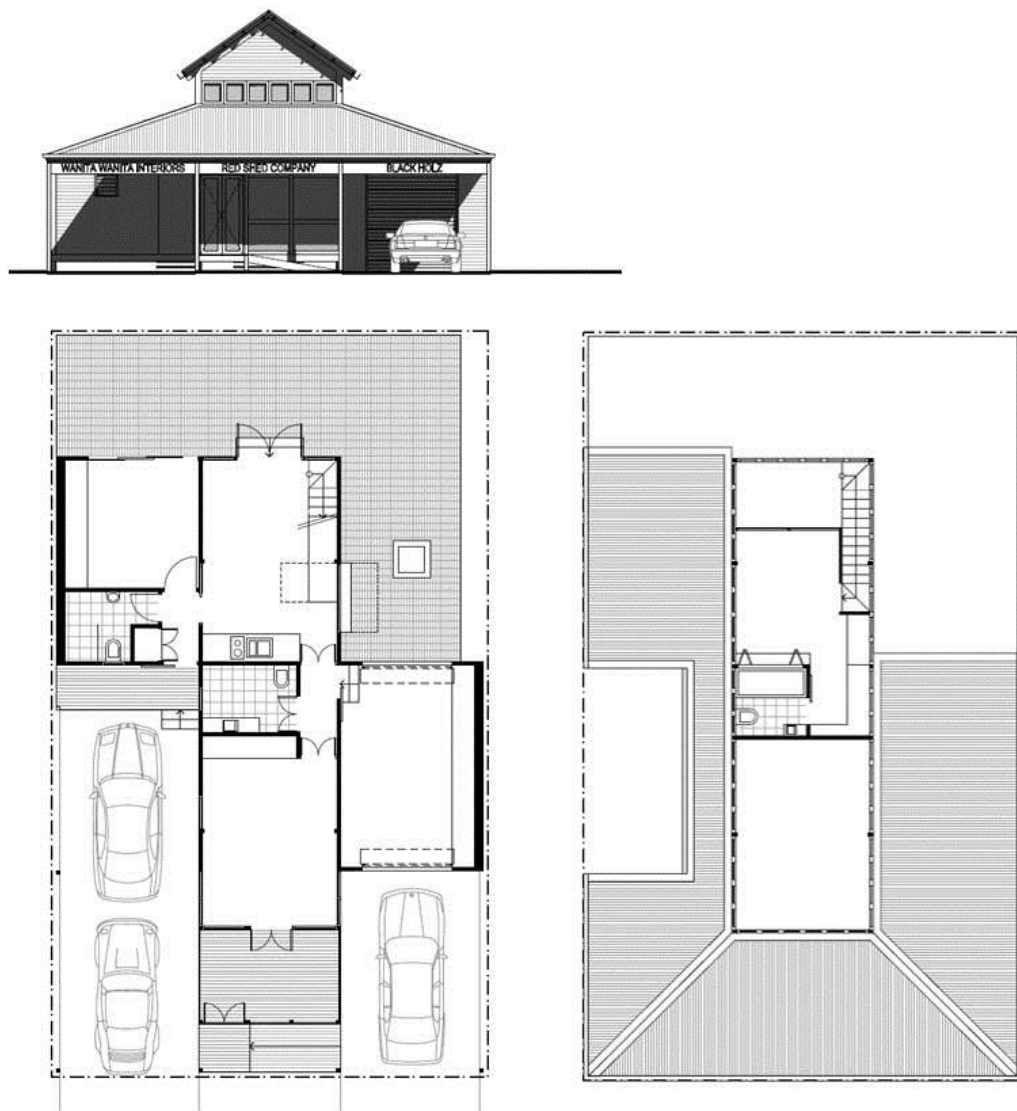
Detailed concept building and site plan – 88 East Street, Clifton
